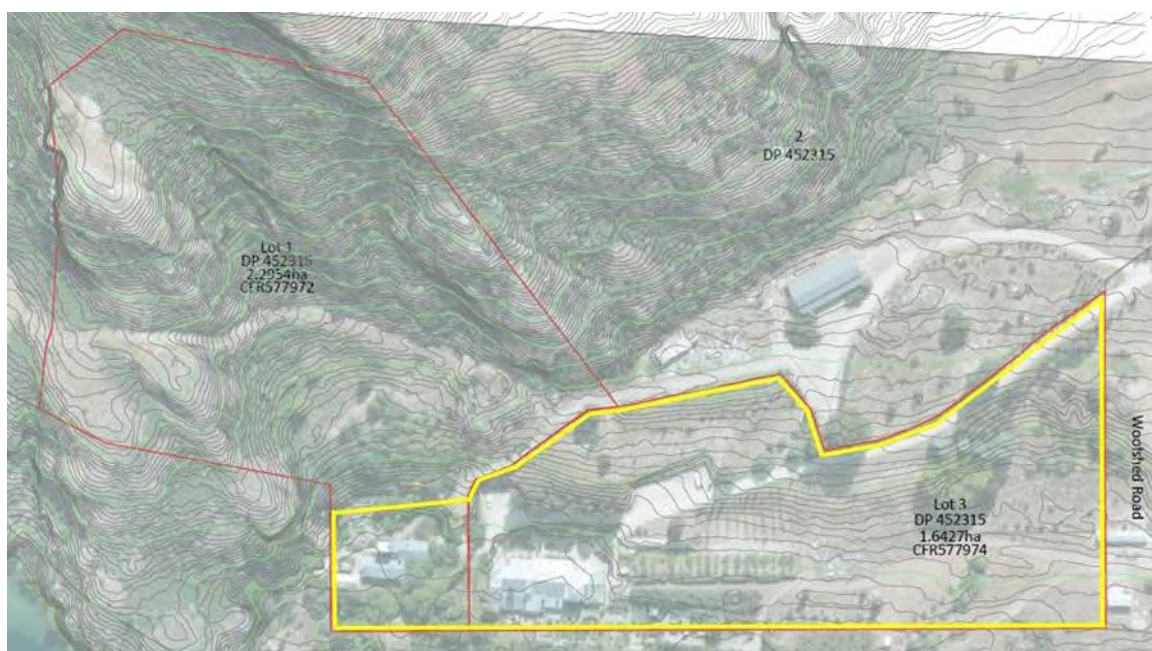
Clark Fortune McDonald & Associates Site Plan (submitted with application)
